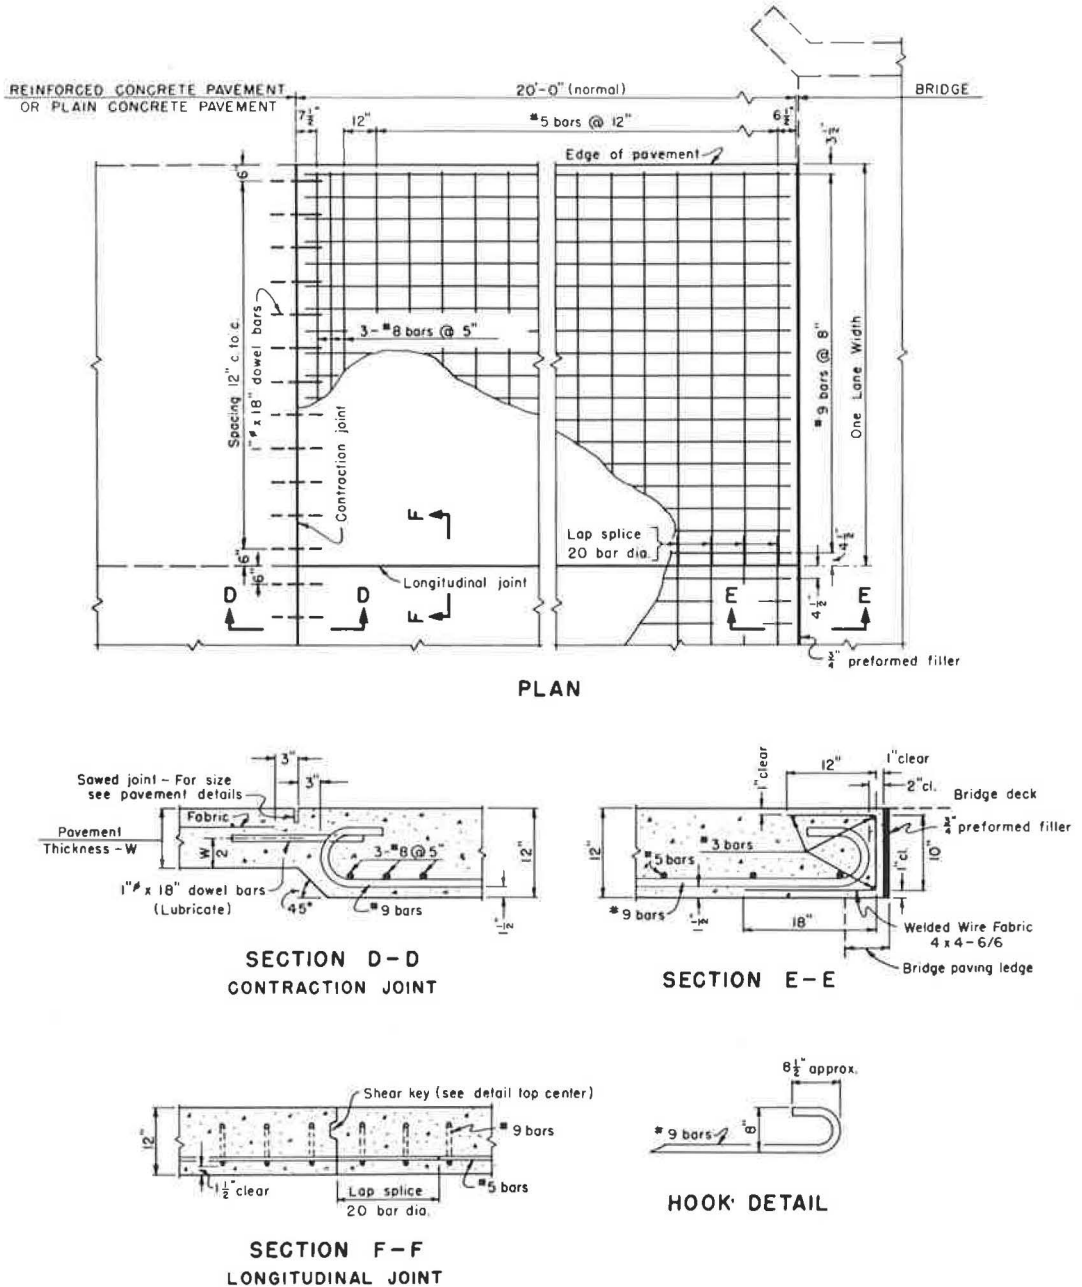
Continuously-reinforced concrete test pavement: reinforced panel at bridge end.
